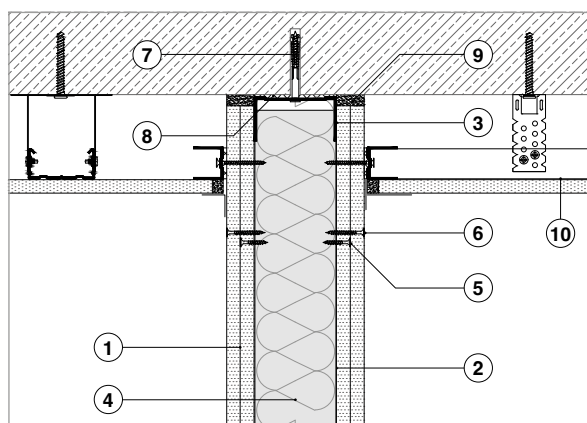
Connecting a partition wall with NORGIPS ceiling lining
